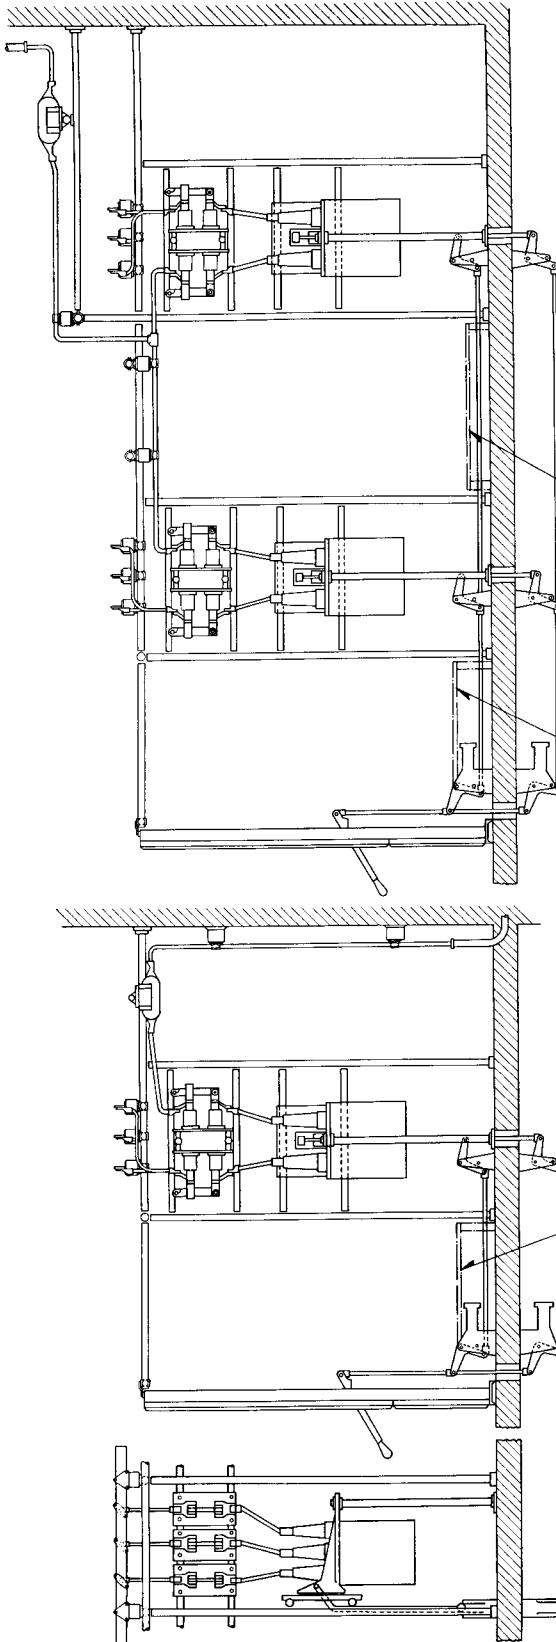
View Showing the Supporting of Conduits Before Pouring Floor.
